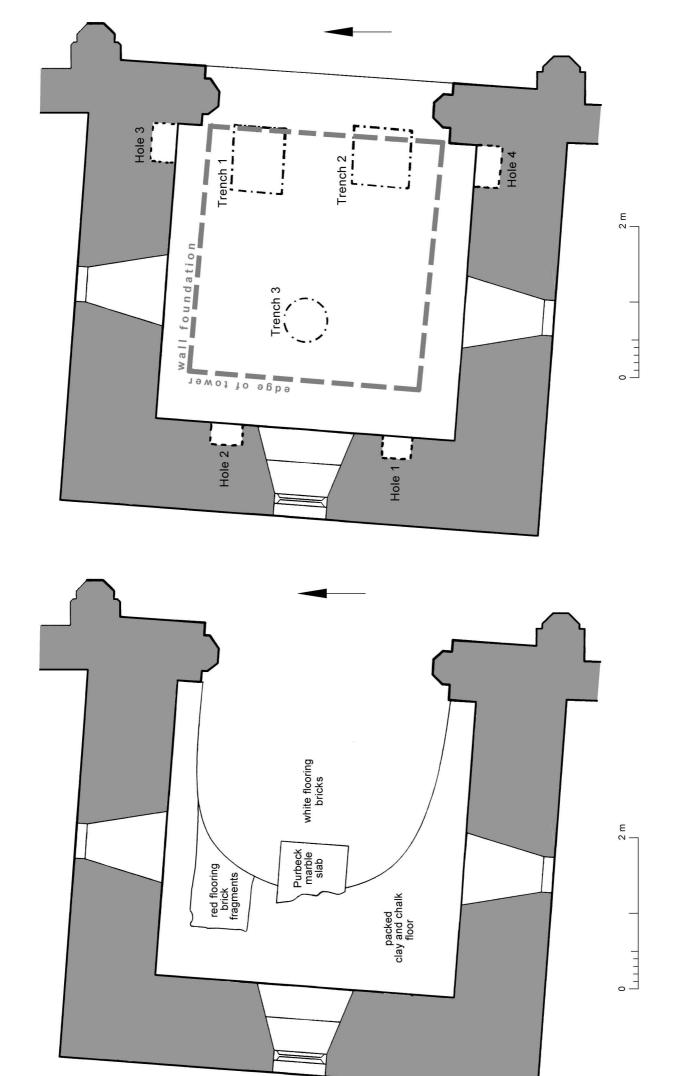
Plan of tower after removal of wooden floor (source: David Whymark Building Design and Conservation).
